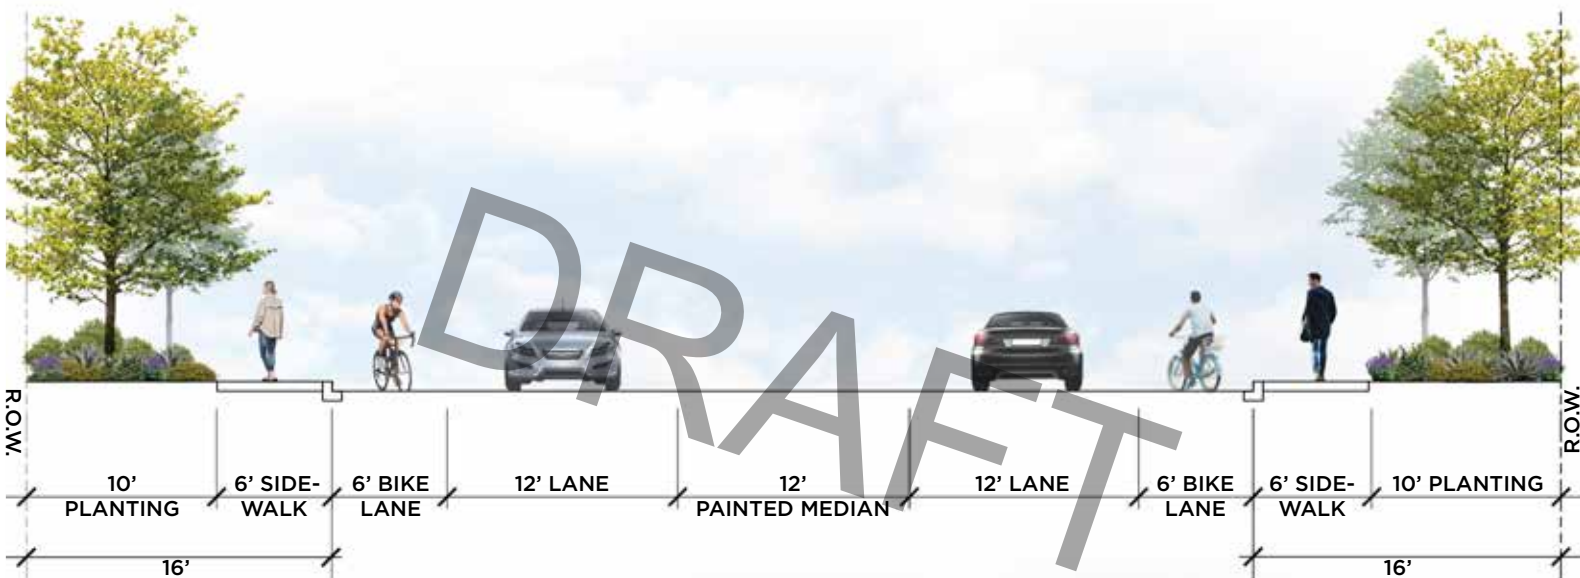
ENLARGEMENT MODIFIED COLLECTOR STREET SECTION G
